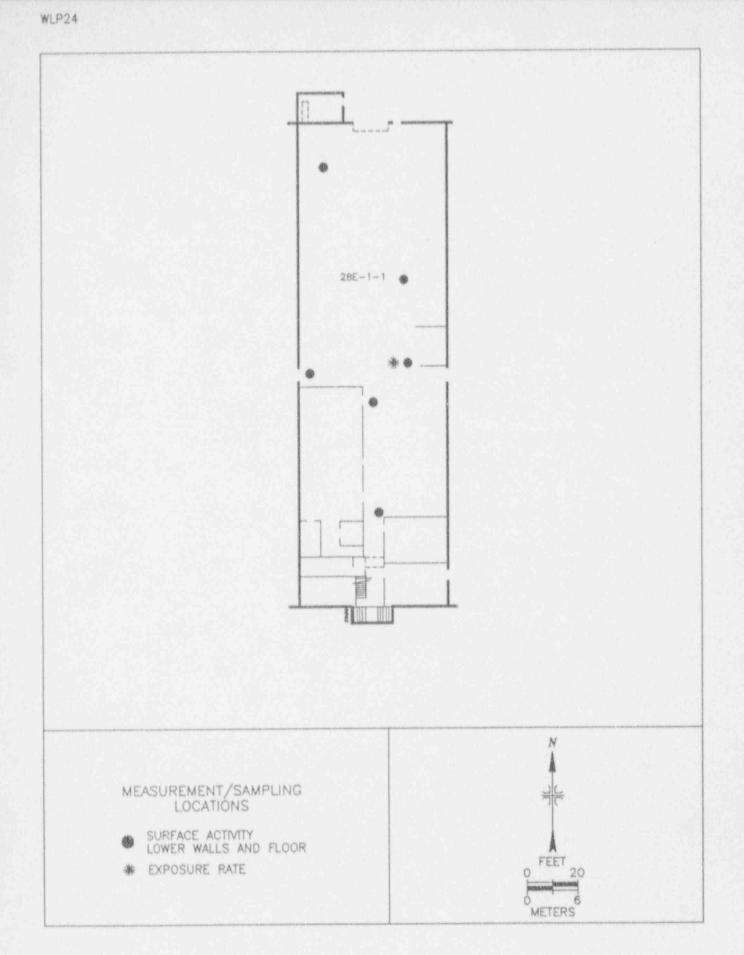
Building 8, First Floor - Measurement and Sampling Locations
